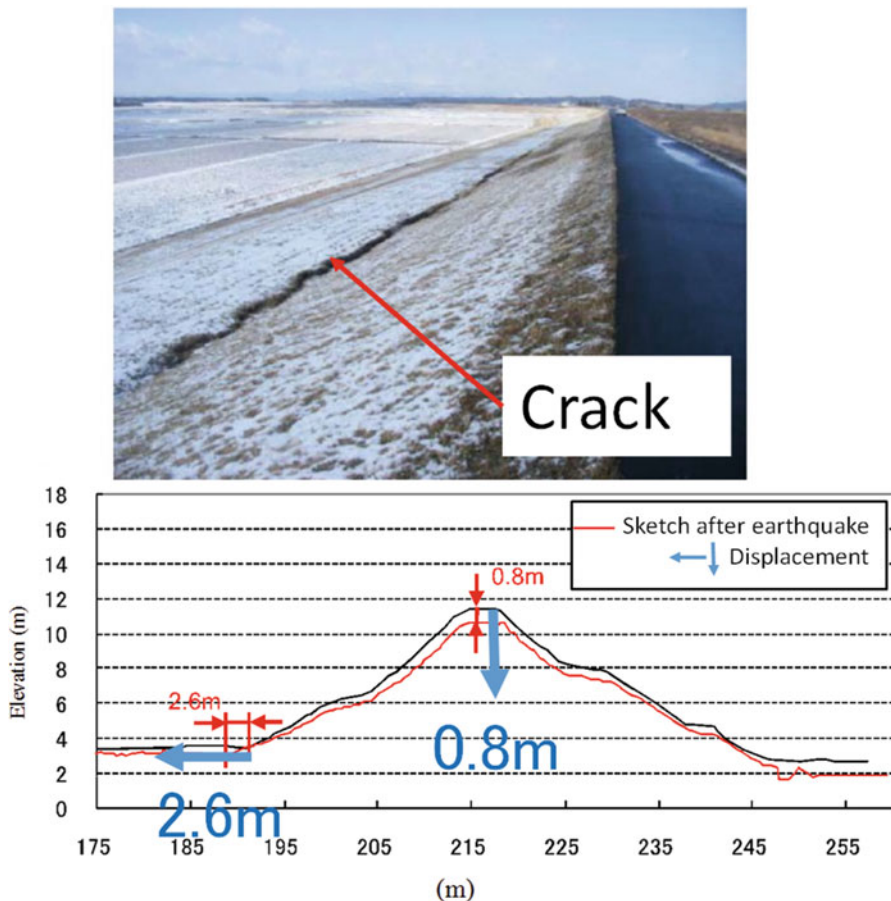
Damage to the river embankment at Site B (Japan Institute of Country-ology and Engineering (JICE) 2011)
